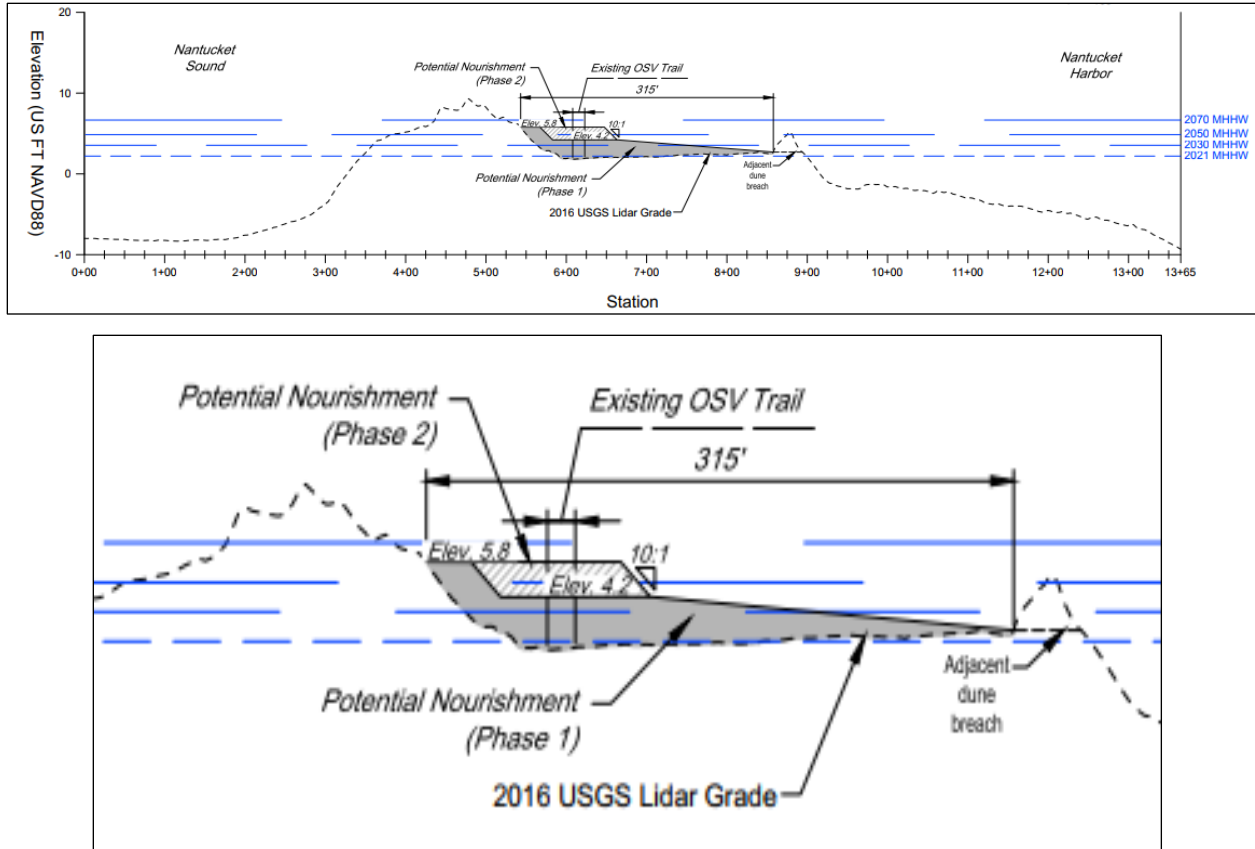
Cross-Section of Potential Nourishment between 1st and 2nd Point.
